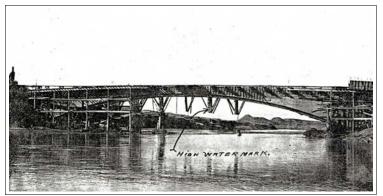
Holbrook Bridge under construction, showing flood damage, 1916
